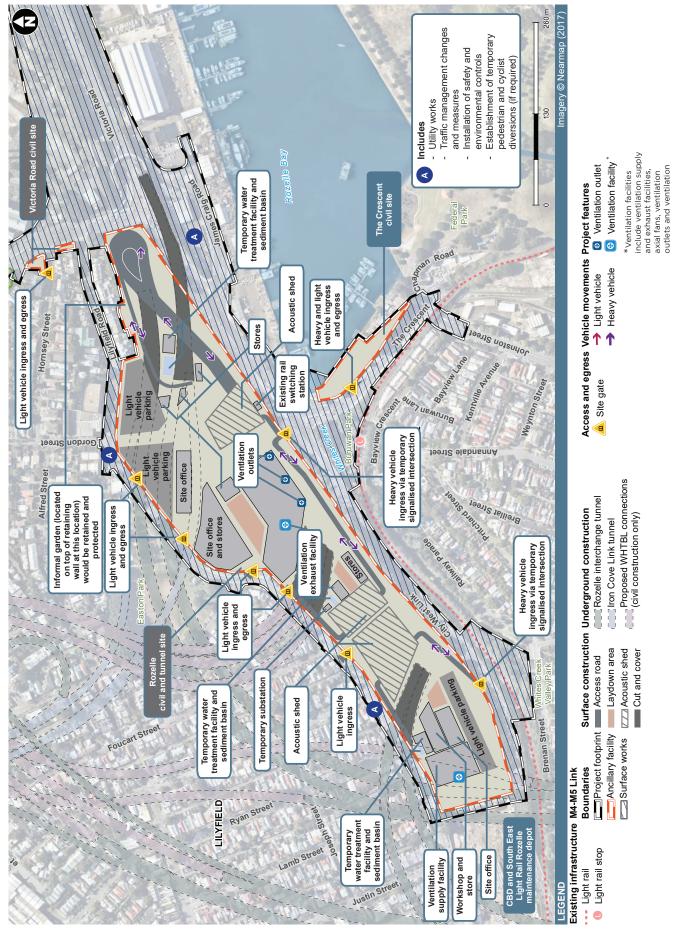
Indicative Rozelle civil and tunnel site and Victoria Road civil site layouts
